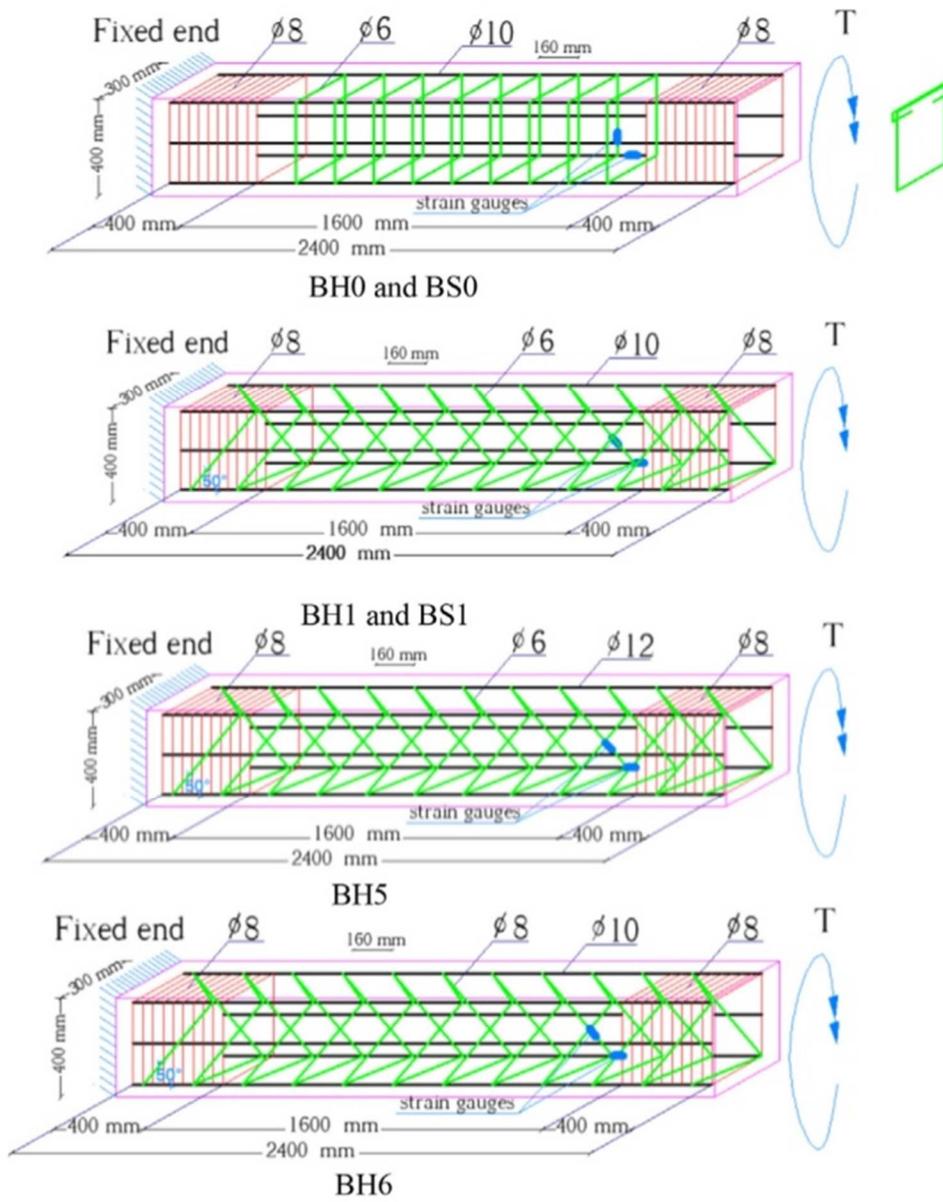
Dimensions and reinforcement details of the tested beam by Ahmed et. al. (2020).
